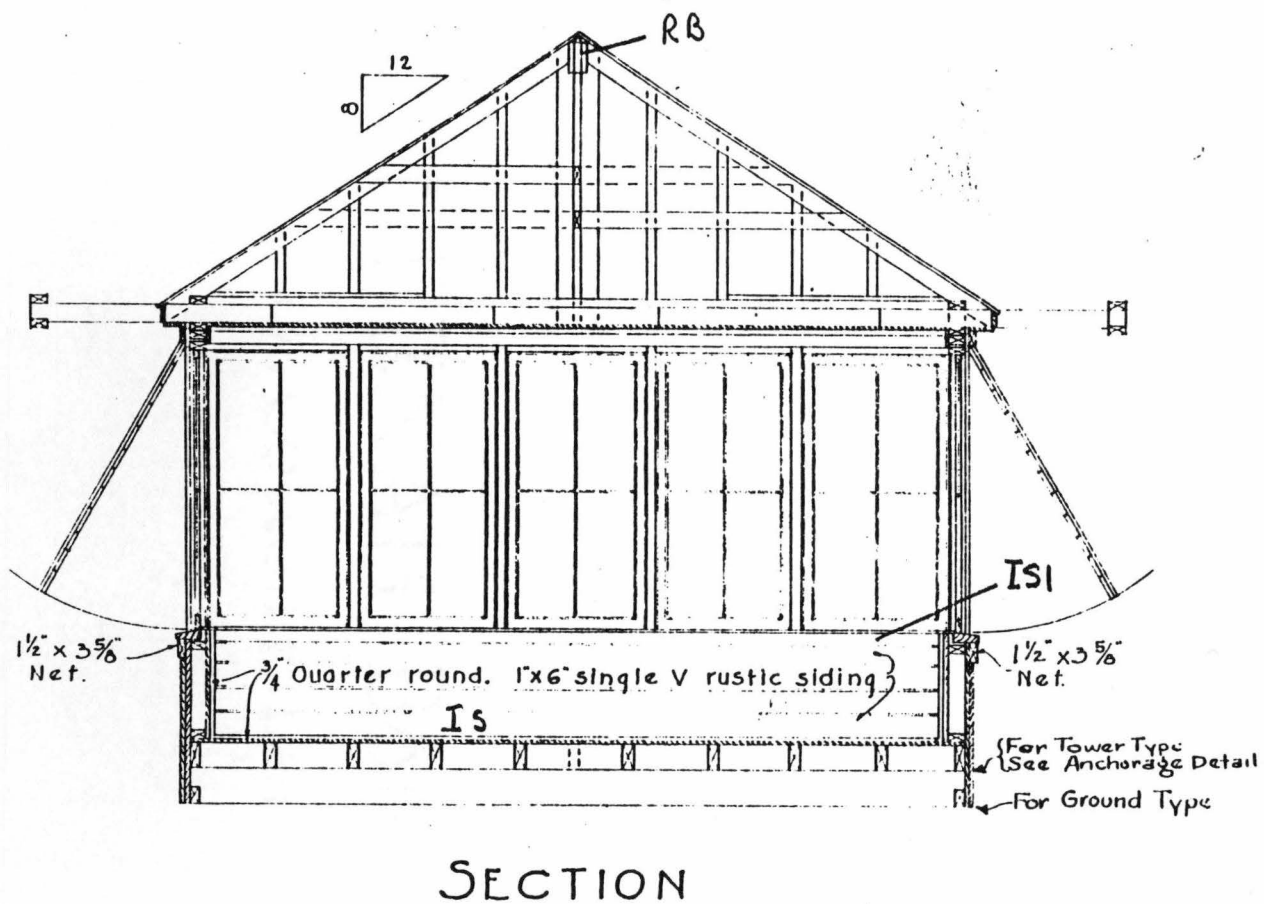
Section of "Standard '36" Lookout Station, 1936.
